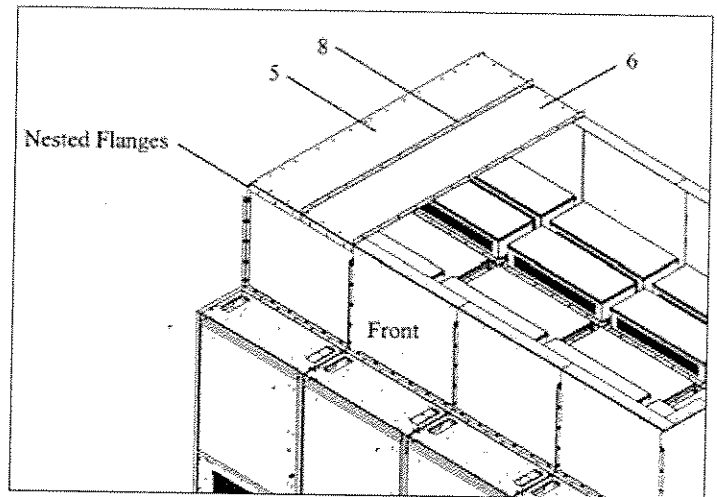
End Roof Panel Nested Inside the Roof Panel Flanges.
